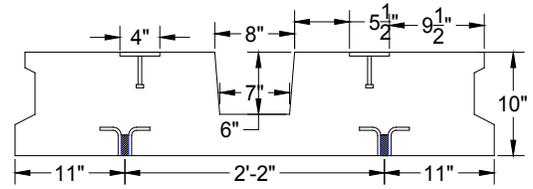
Cross Section of Sallow Flat Soffit Precast Floor Beam at B-B (ft = 0.3048m)
